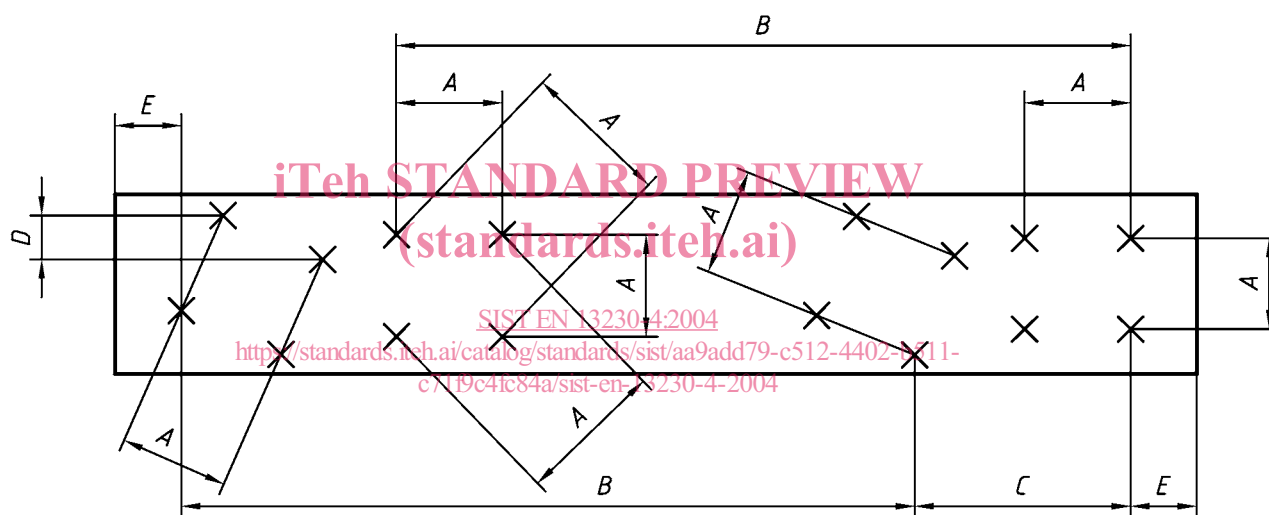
Measurement of tolerances on fastening components positioning
